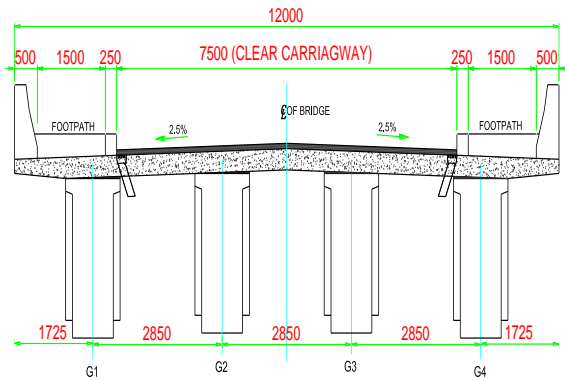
C/S Along Transverse direction for Four Girder Arrangement
